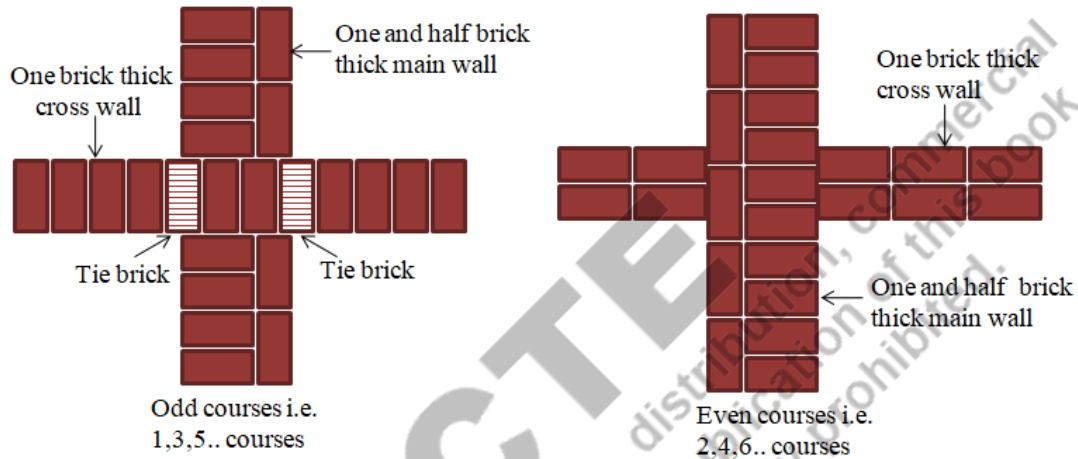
(a) Cross junction between one and a half brick thick wall and one brick thick wall
